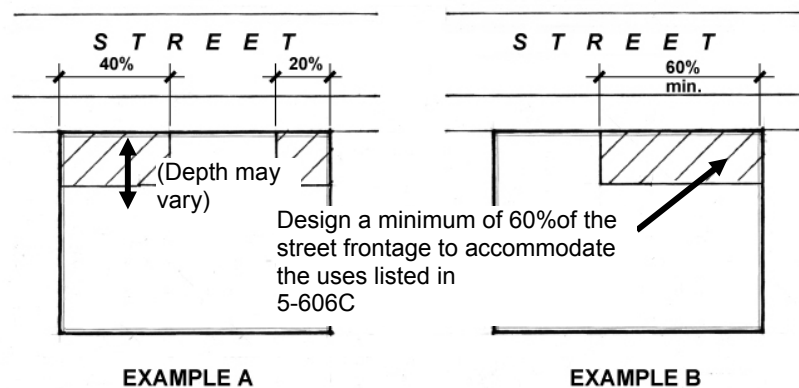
B. Example of 60% Ground Floor Uses at Street Intersections within Station Areas
